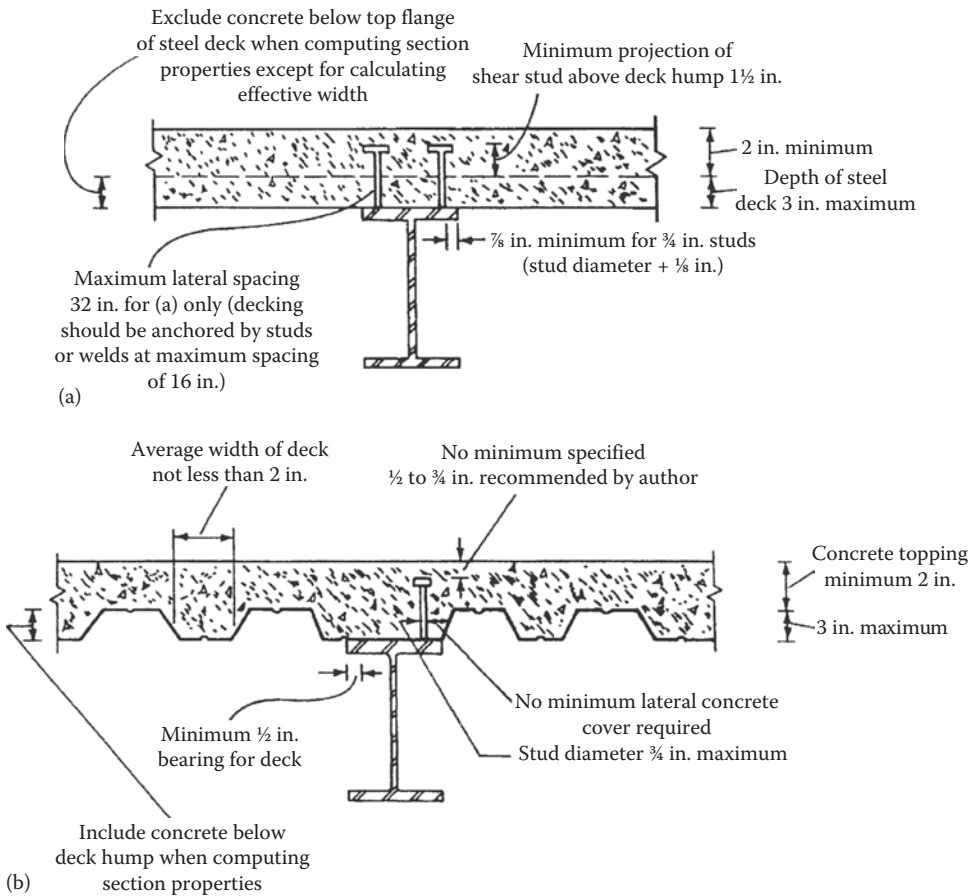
Composite beam, AISC requirements: (a) deck perpendicular to beam; (b) deck parallel to beam. *Note:* Dimension and clearance restrictions shown in either (a) or (b) apply to both unless noted.
